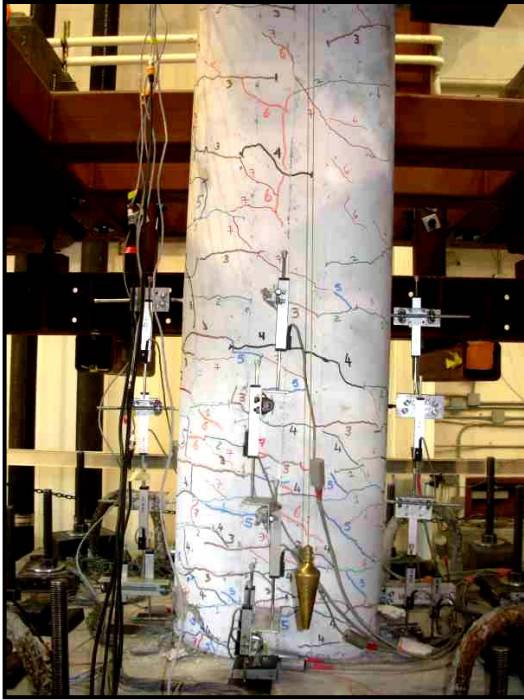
Specimen I1, Increasing of Cracks and Spalling (SYLx1.2)
